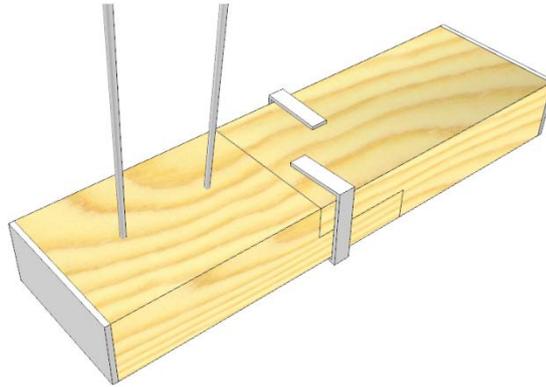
Lap joint specimen (upside down) with electrodes installed at the bottom side
